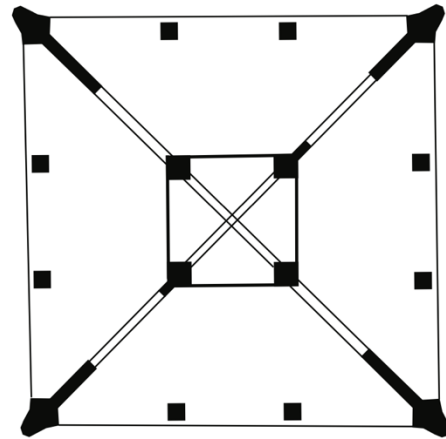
Floor Plan of the Montreal Stock Exchange Tower exhibiting the primary structural system
